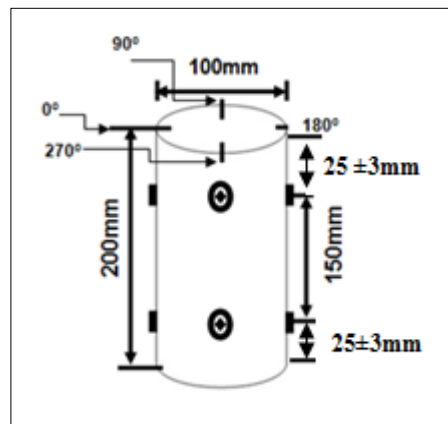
Illustration of the demec fixation on concrete specimens Ø100mm×200mm
